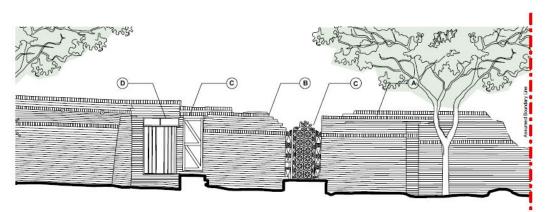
Existing front elevation as viewed from No. 22 Frognal Way
